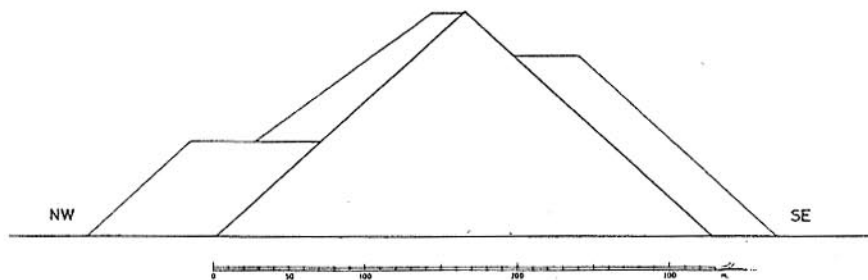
B. Pyramid and accretion construction ramp in cross-section on the NW-SE diagonal of the pyramid.
